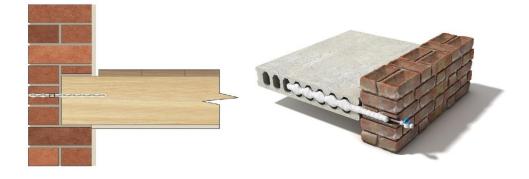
Brickwork façade restrained from bowing out of plane and heavy duty repair to masonry façade.
